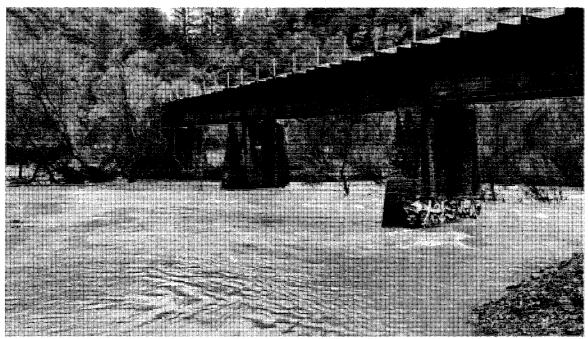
Bridge 151.99 Outlet Creek heavy flow
